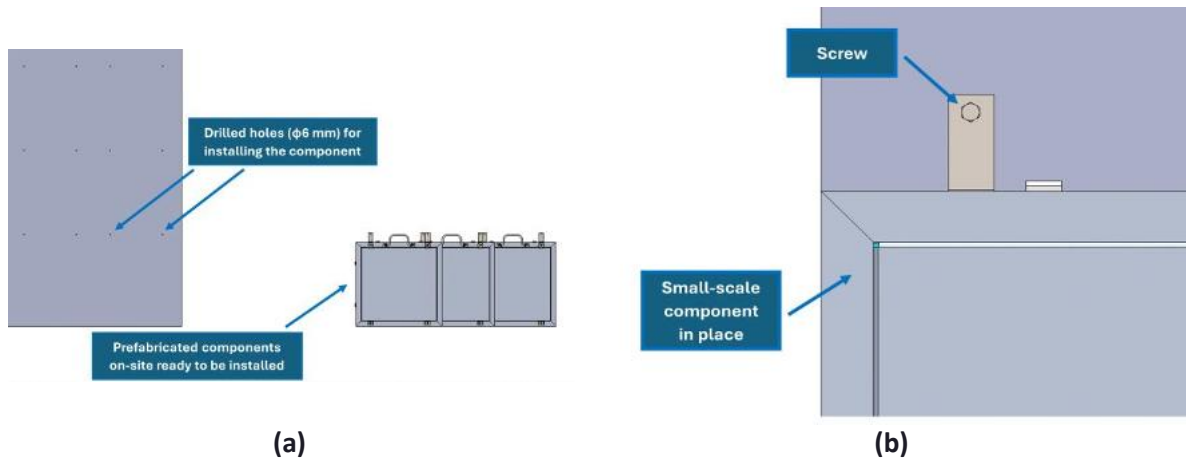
Installation process for the prefabricated component. (a) Drilled holes and on-site components ready to be installed, and (b) installation of a component.
